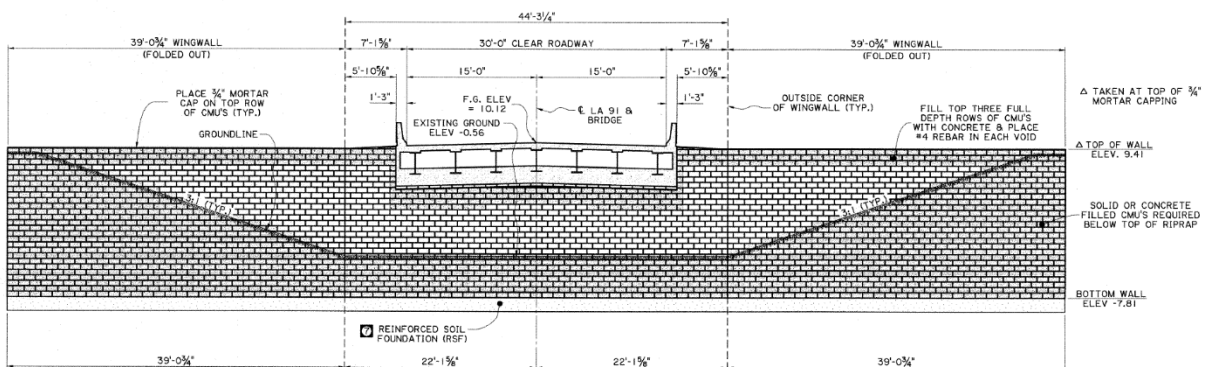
Diagram. GRS abutment elevation view of Maree Michel Bridge.
